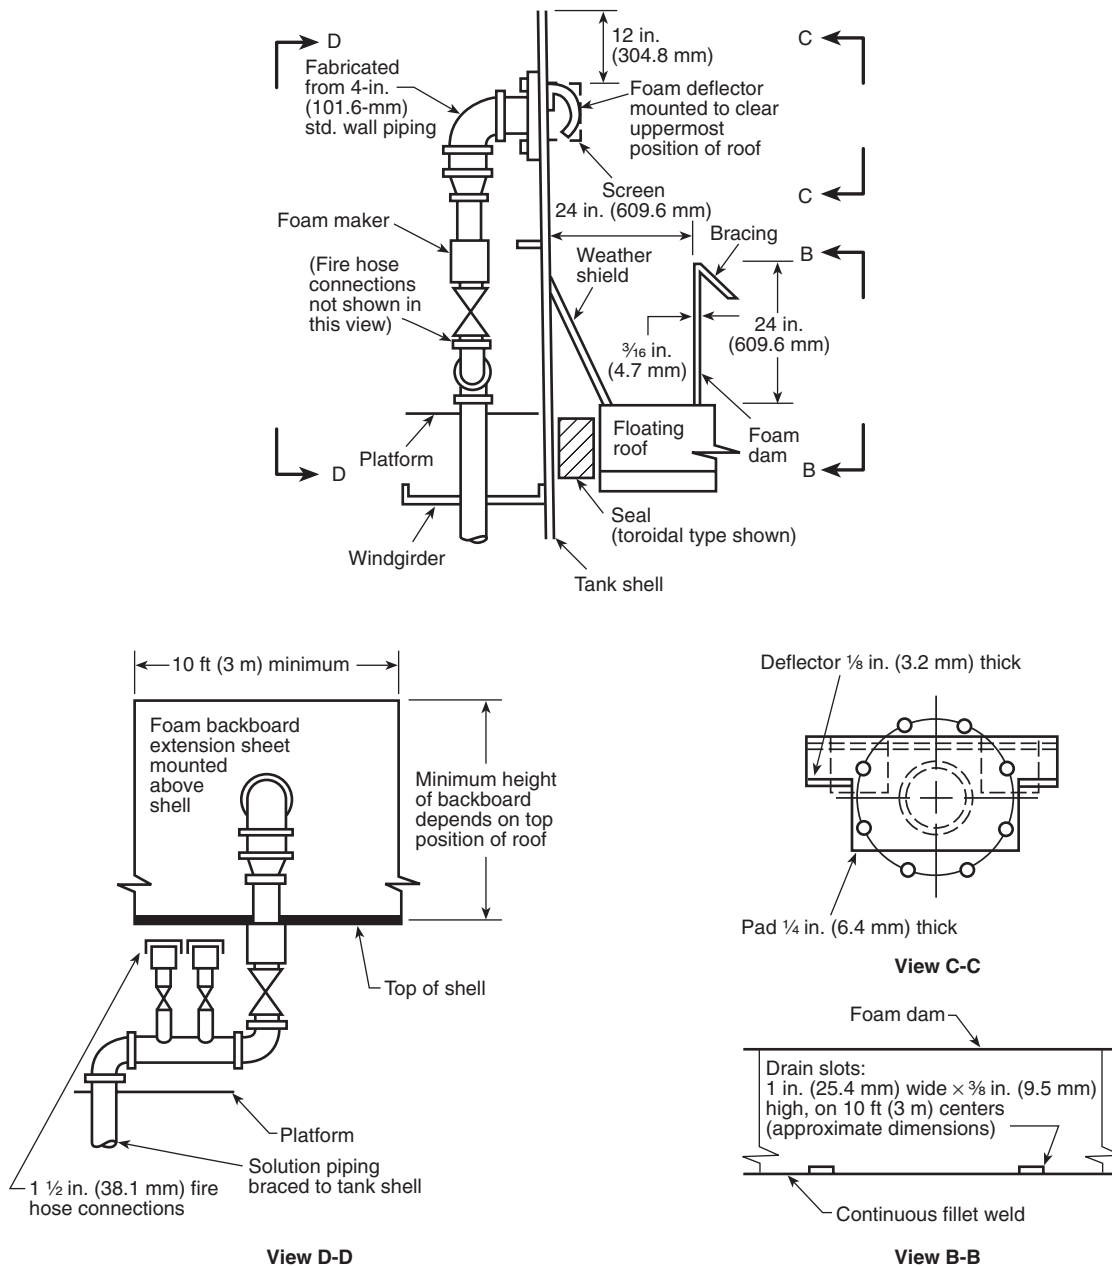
Typical installation of foam handlines for seal area fire protection.
